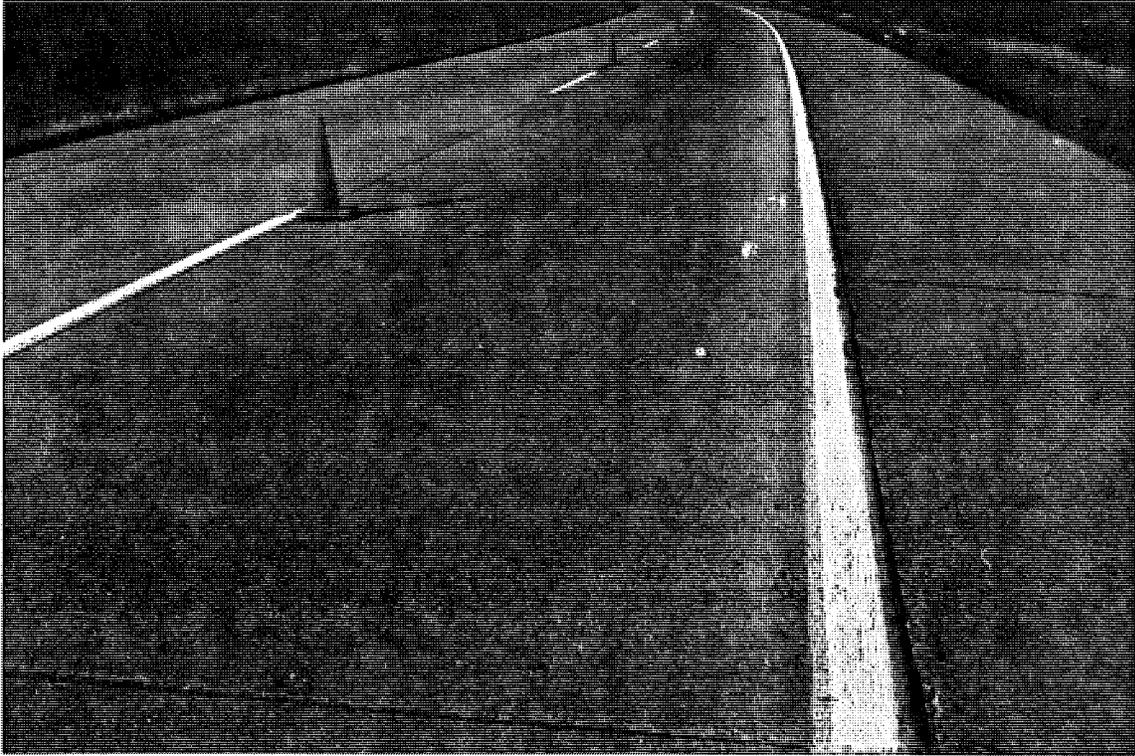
An overview of the end of the test section of CSN# 19043-02234A WB, looking west. This section has 41 ft joint spacings in the driving lanes, but only 14 ft joint spacing in the shoulders.
